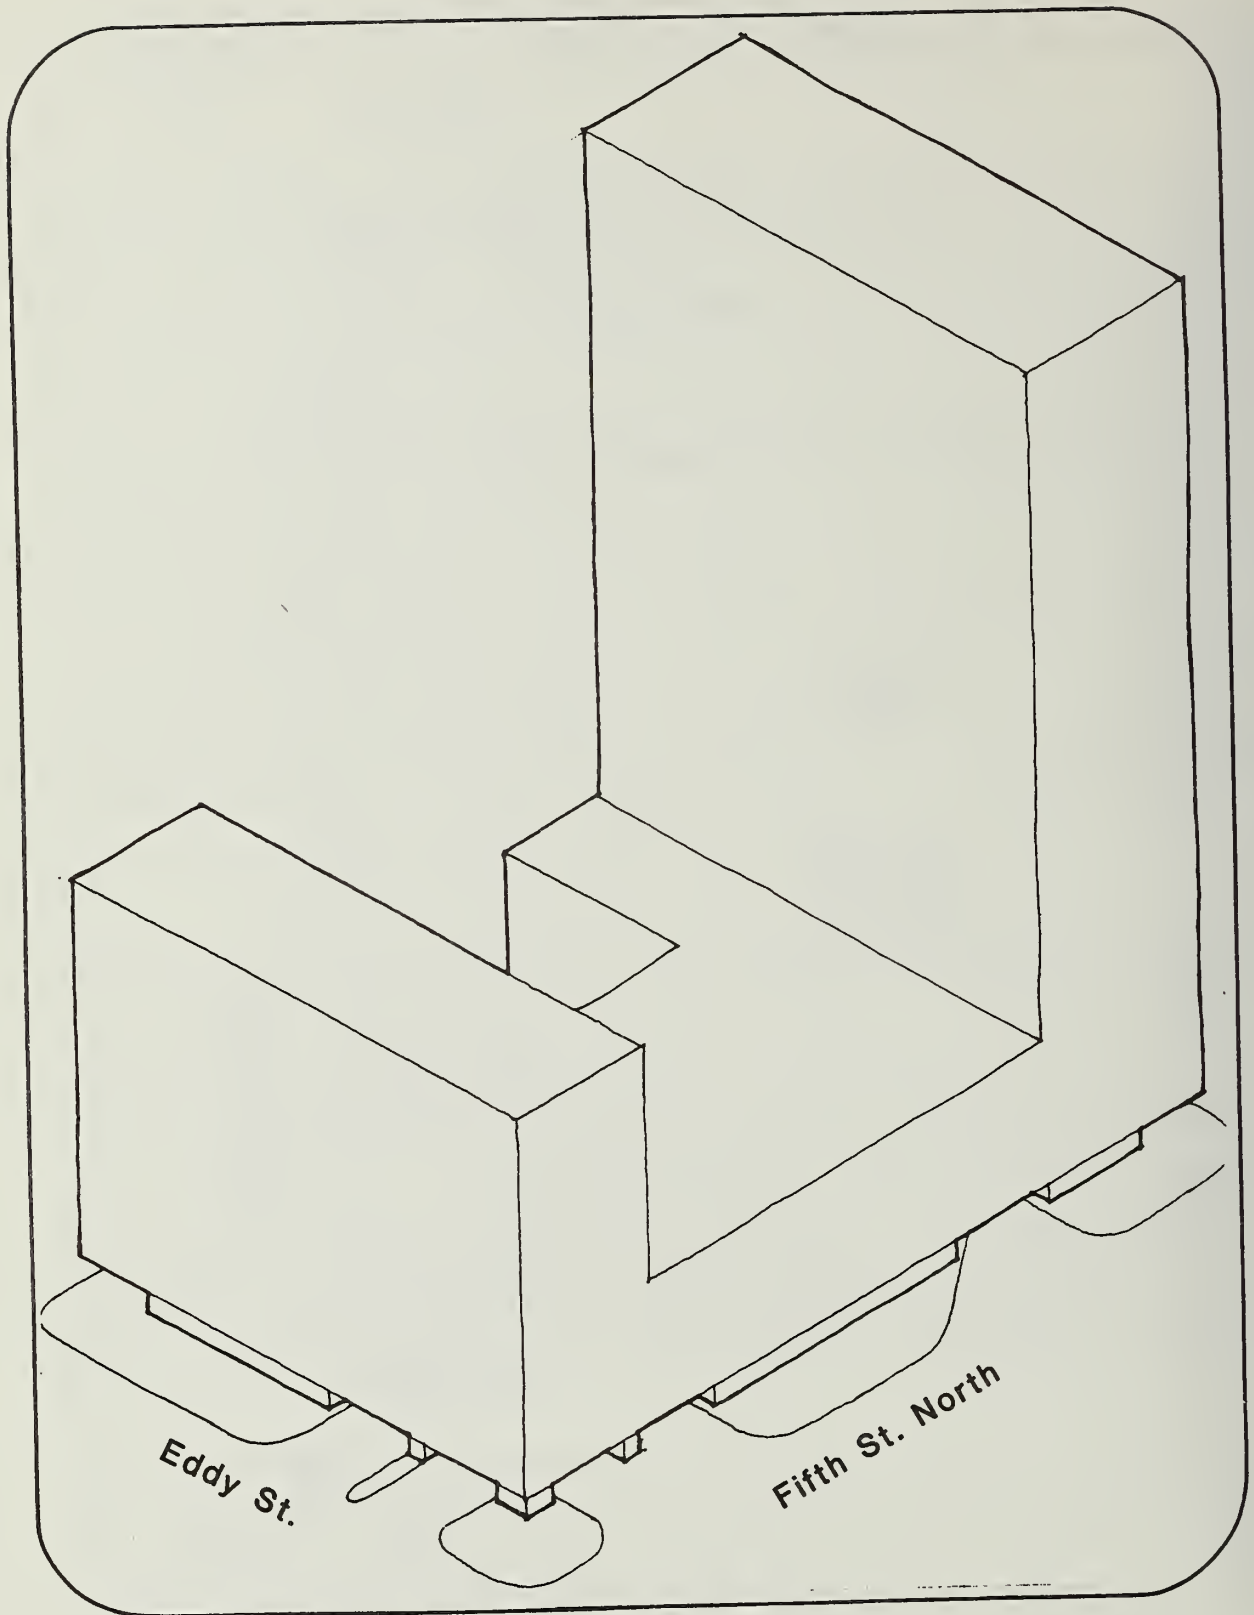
TWO-TOWER ALTERNATIVE -
